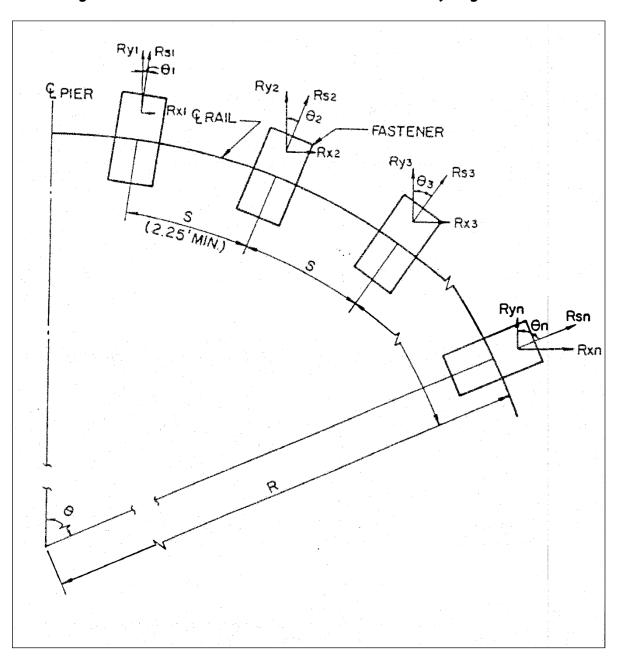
Lateral Restraint of Transverse Force in Rail by Single Fastener
